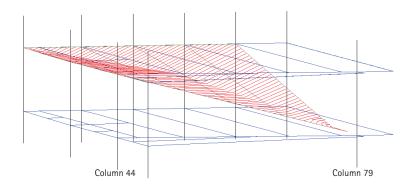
Alternate perspective view of floor deformation hinge strips
